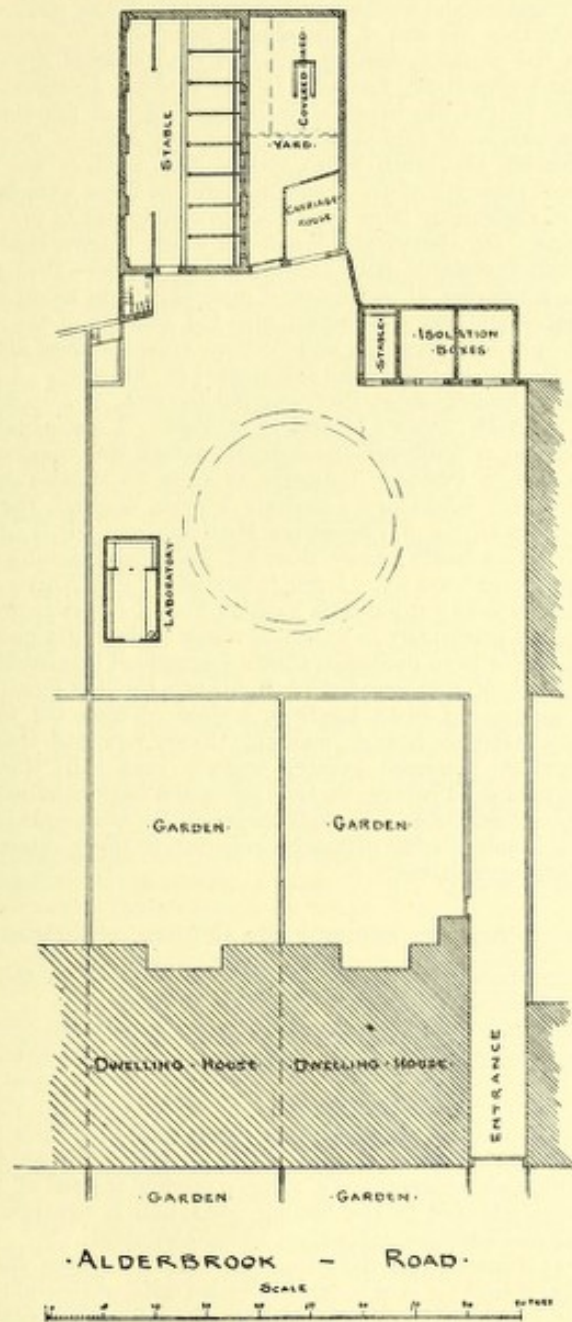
PLAN OF STABLES, ETC., AT ALDERBROOK ROAD, BALHAM.
